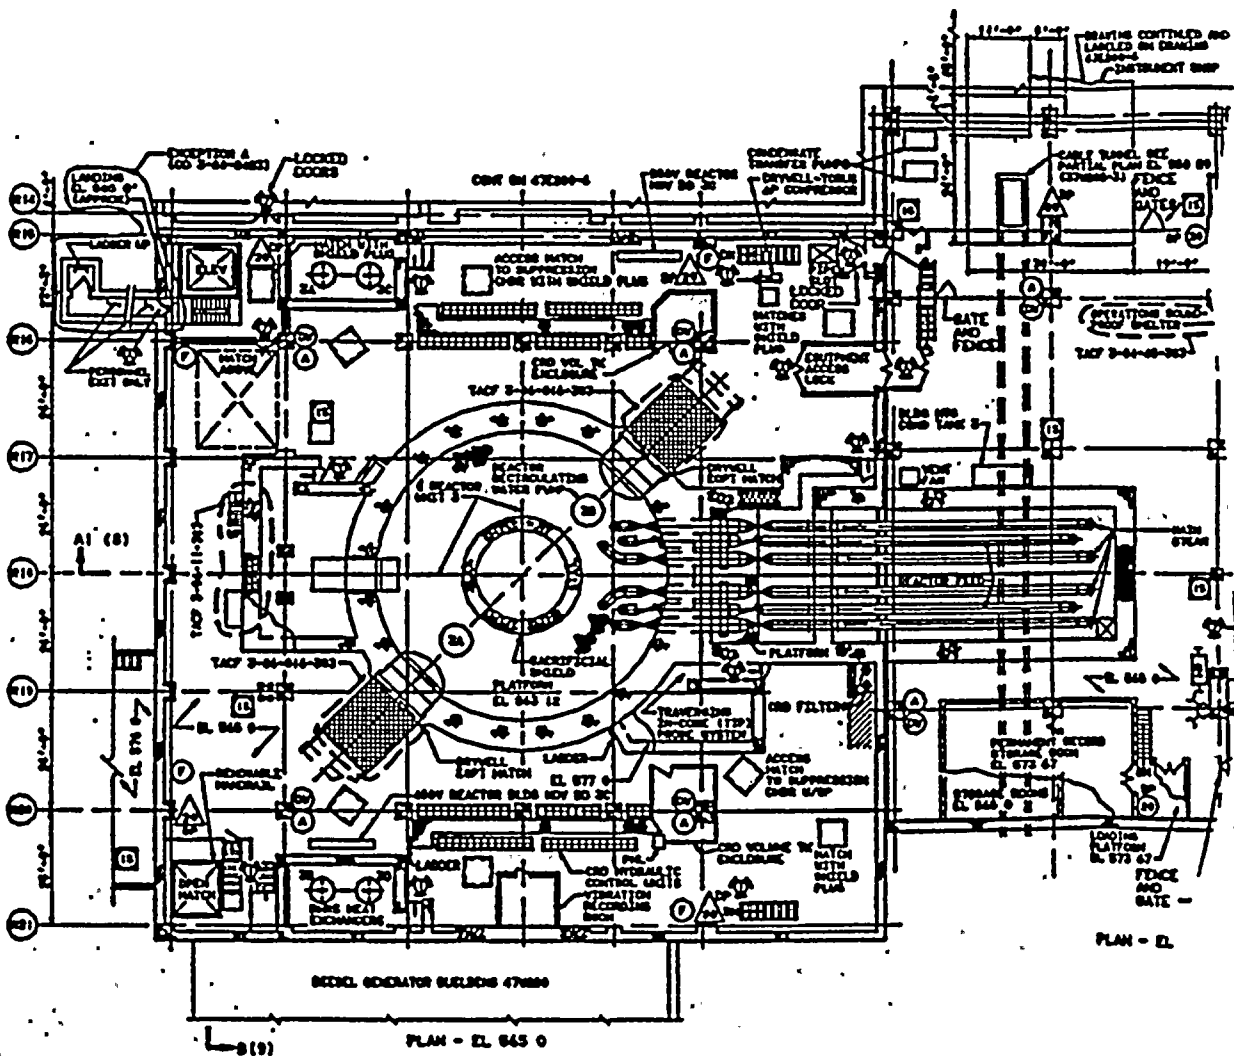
(Page 1 of 2). Reactor Building, Elevation 565'
